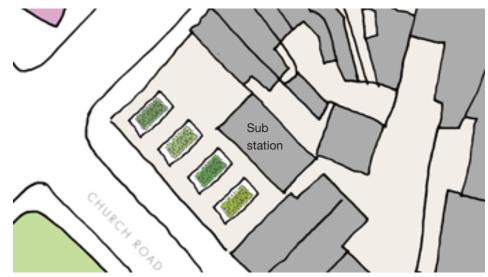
A sketch showing a plan for a temporary community garden at the corner of Church Road
